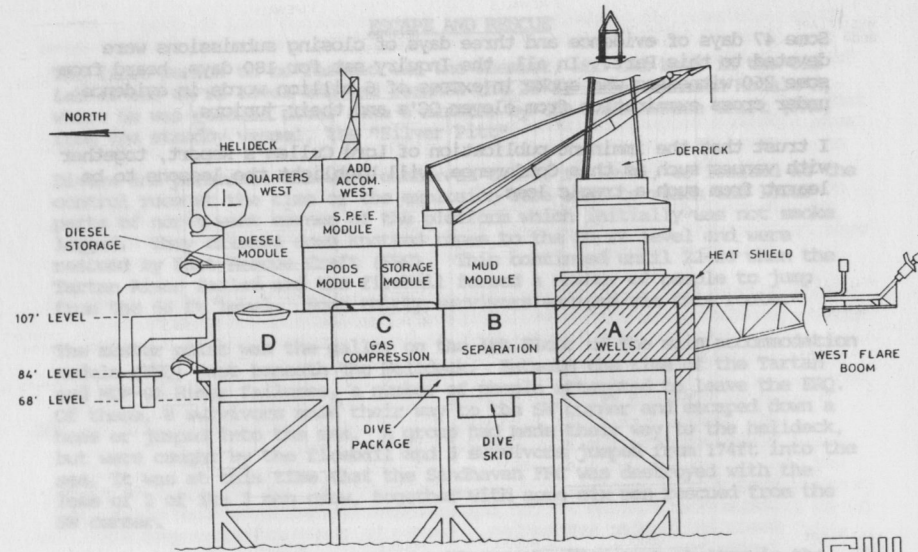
PIPER ALPHA - WEST ELEVATION
